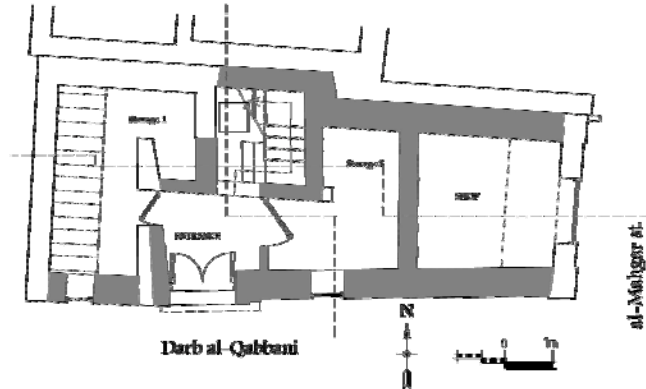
Ground Floor Plan, replaced walls in dark.
